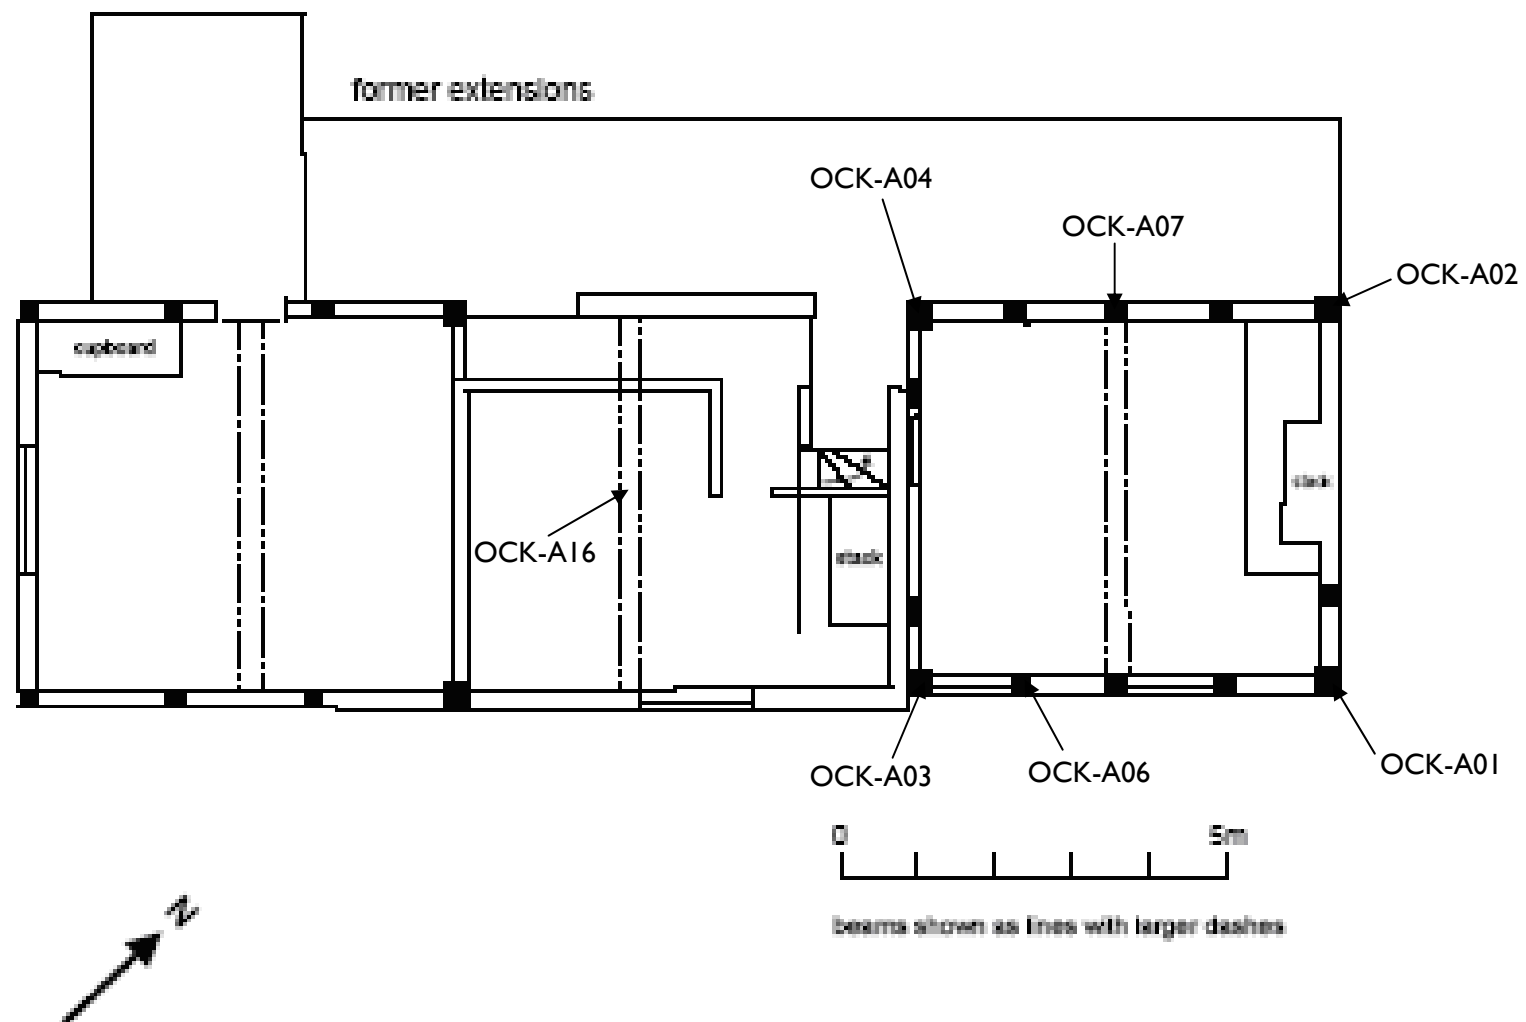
Church Farm House; first-floor plan, showing the location of samples OCK-A01–4, OCK-A06–07, and OCK-A16 (Richard Sheppard)
